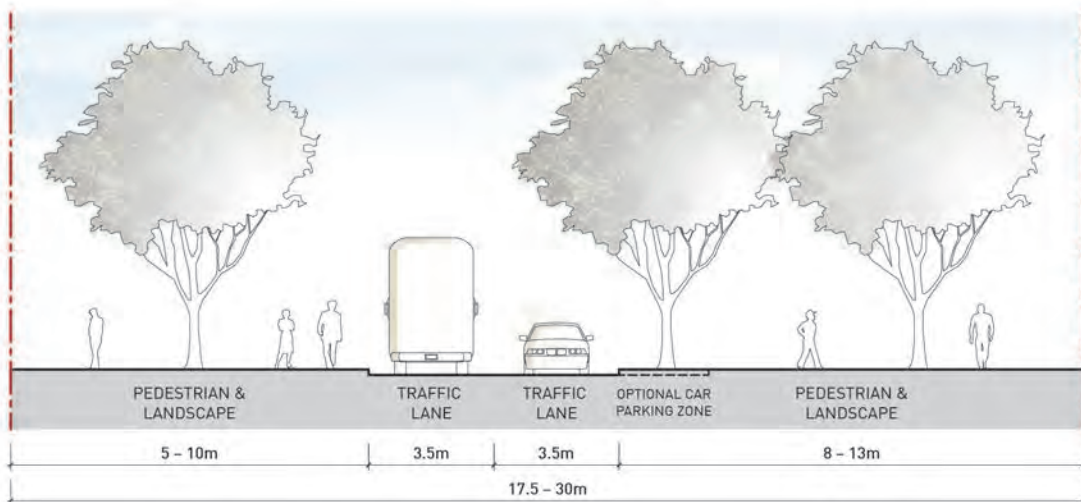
PRIMARY ROAD (17.5 - 30M)
